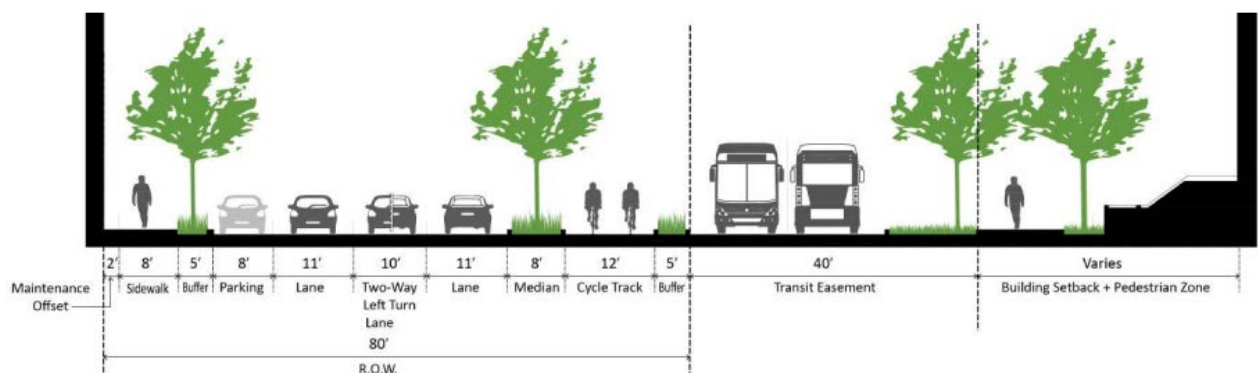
Sector Planned Cross-Section of Rock Spring Drive Road Diet facing west
